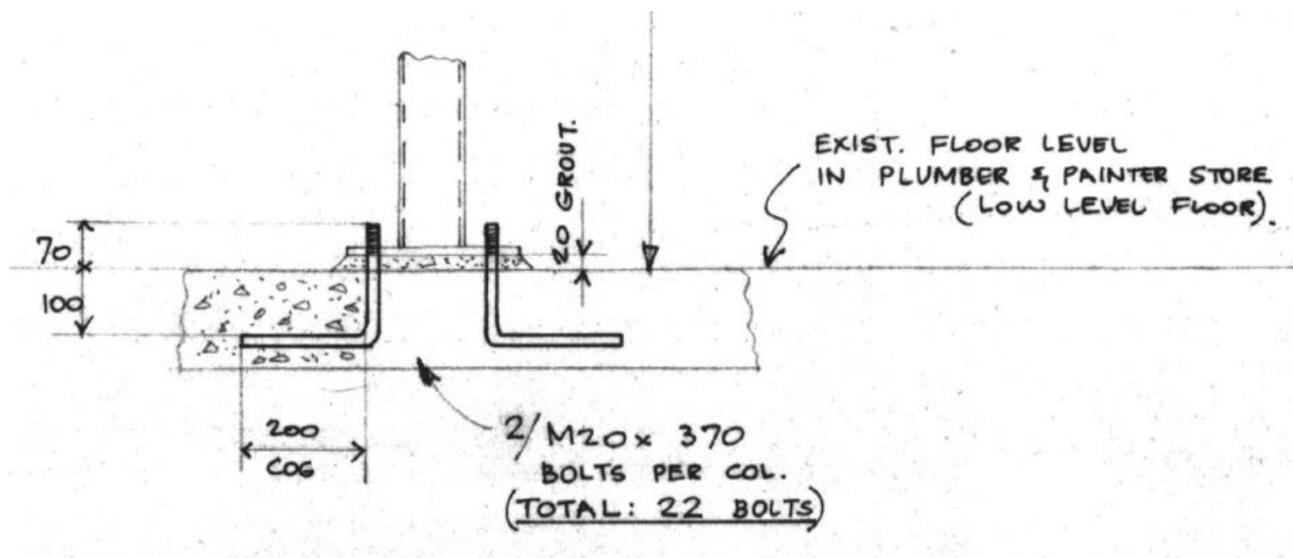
Detail of footing for Carpenter's Workshop/ Store, 1986
